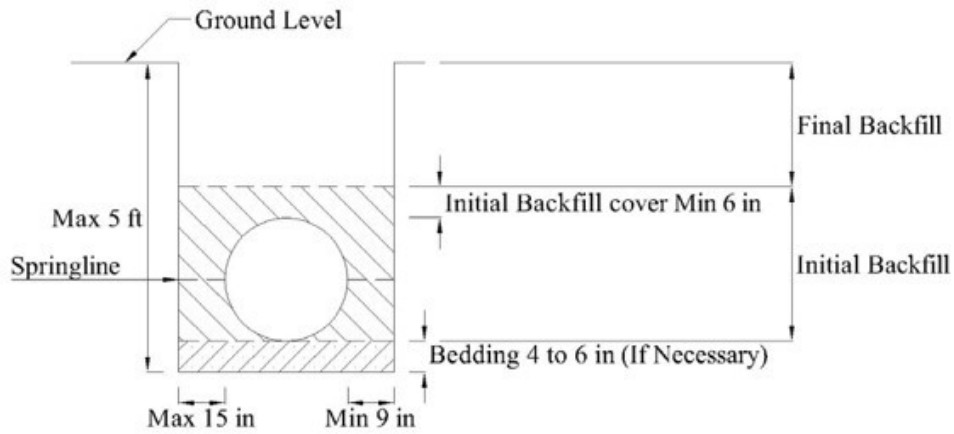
Typical Trench with flat bottom, Manual Installation of Backfill
